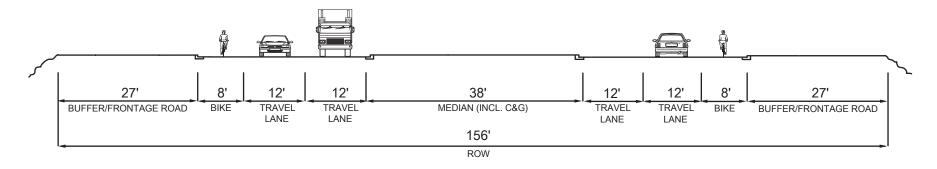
Street Type 7.2 – Urban Boulevard B
